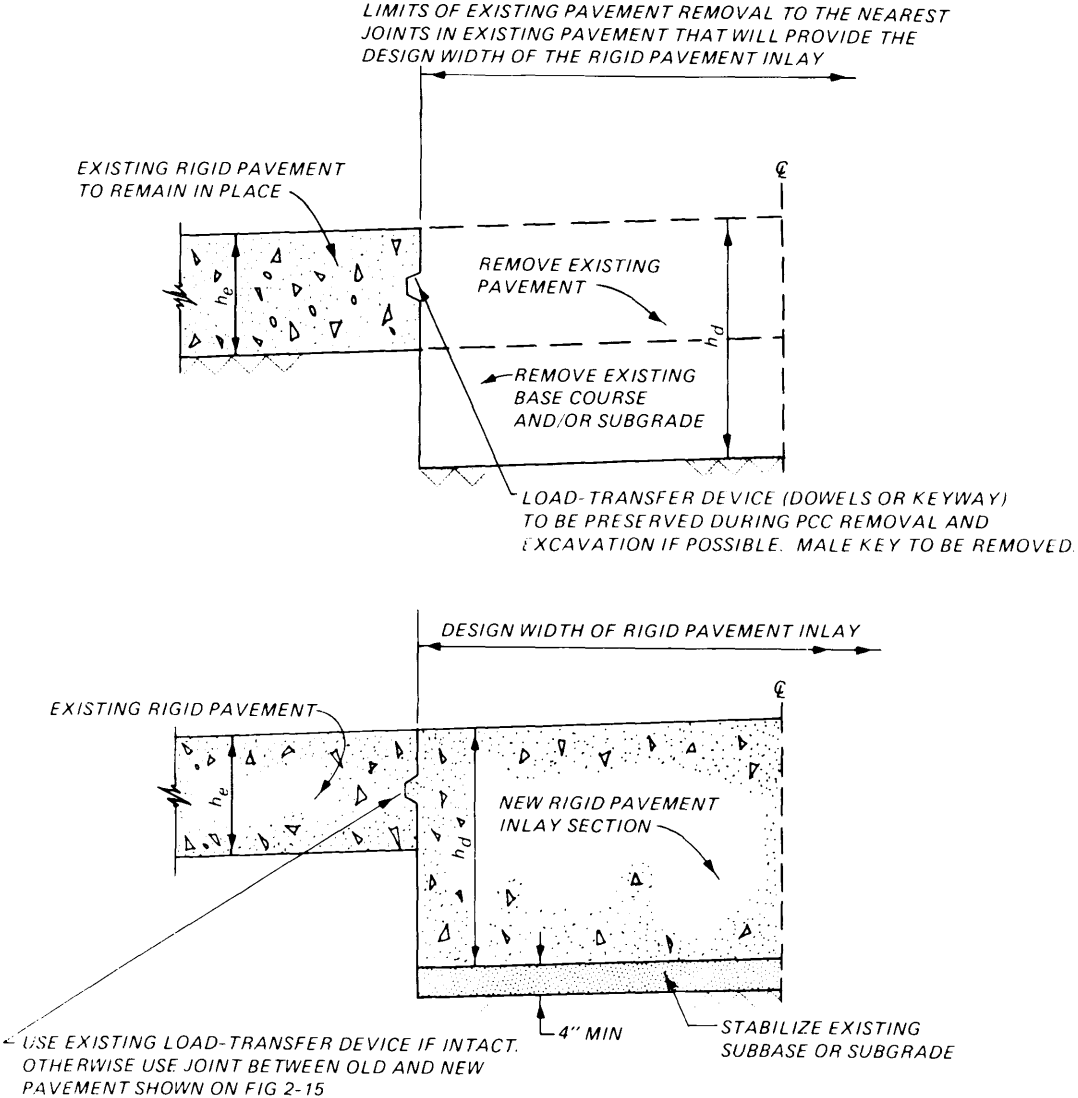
Typical rigid pavement inlay using existing rigid pavement.
